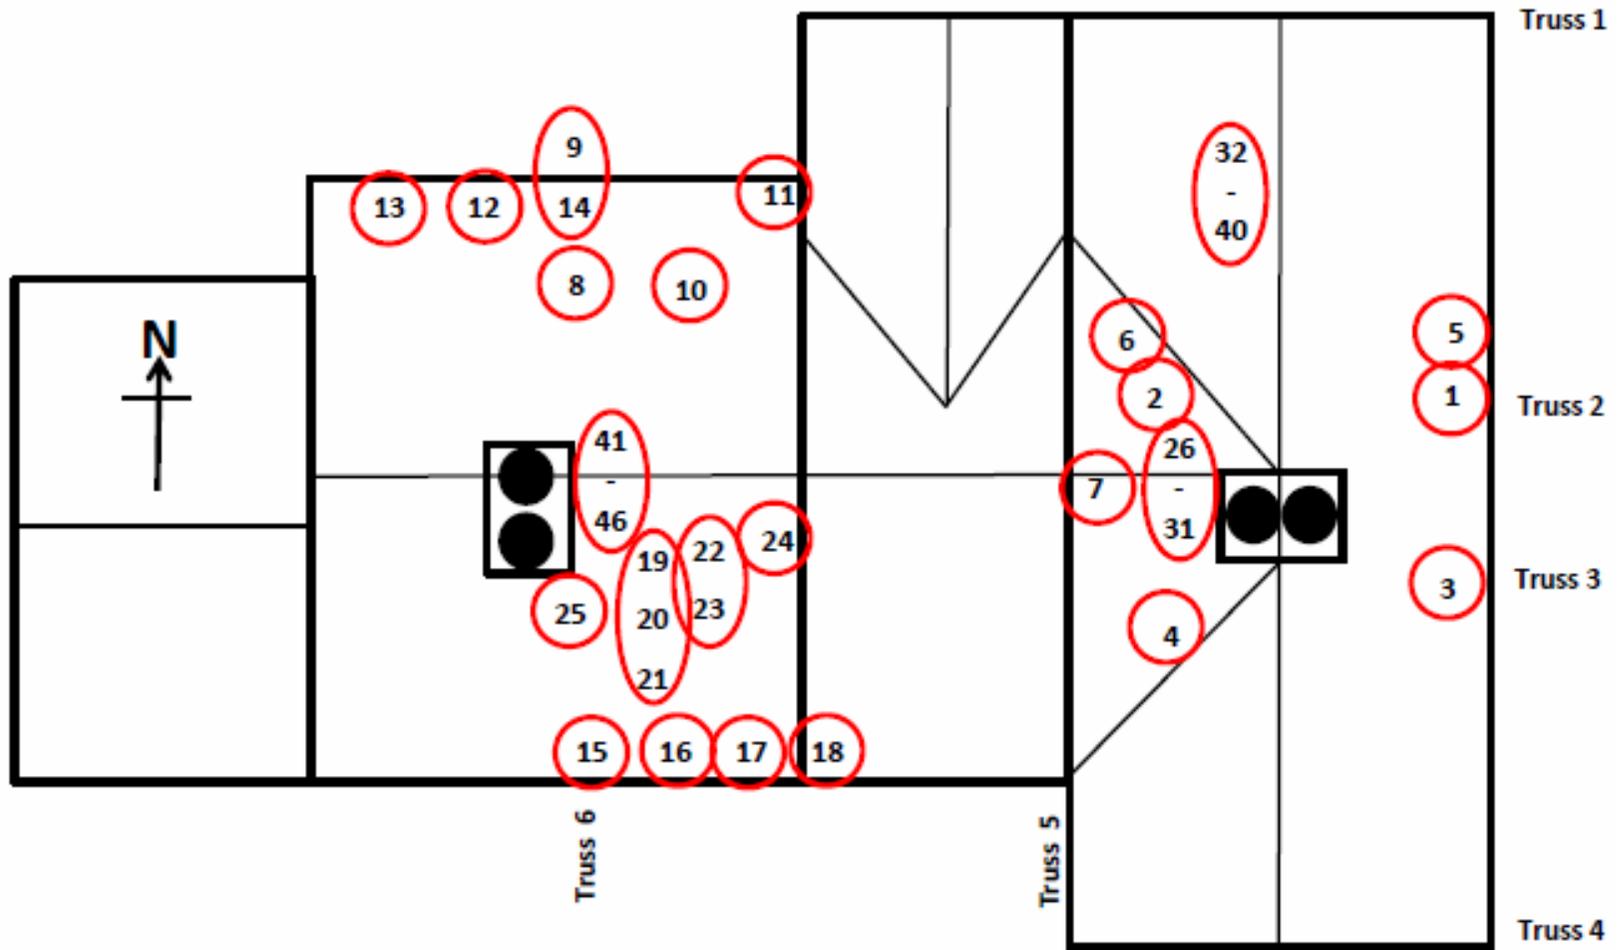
Simple schematic plan of Tonge Hall to show arrangement of the rooms and the general location of the sampled timbers
